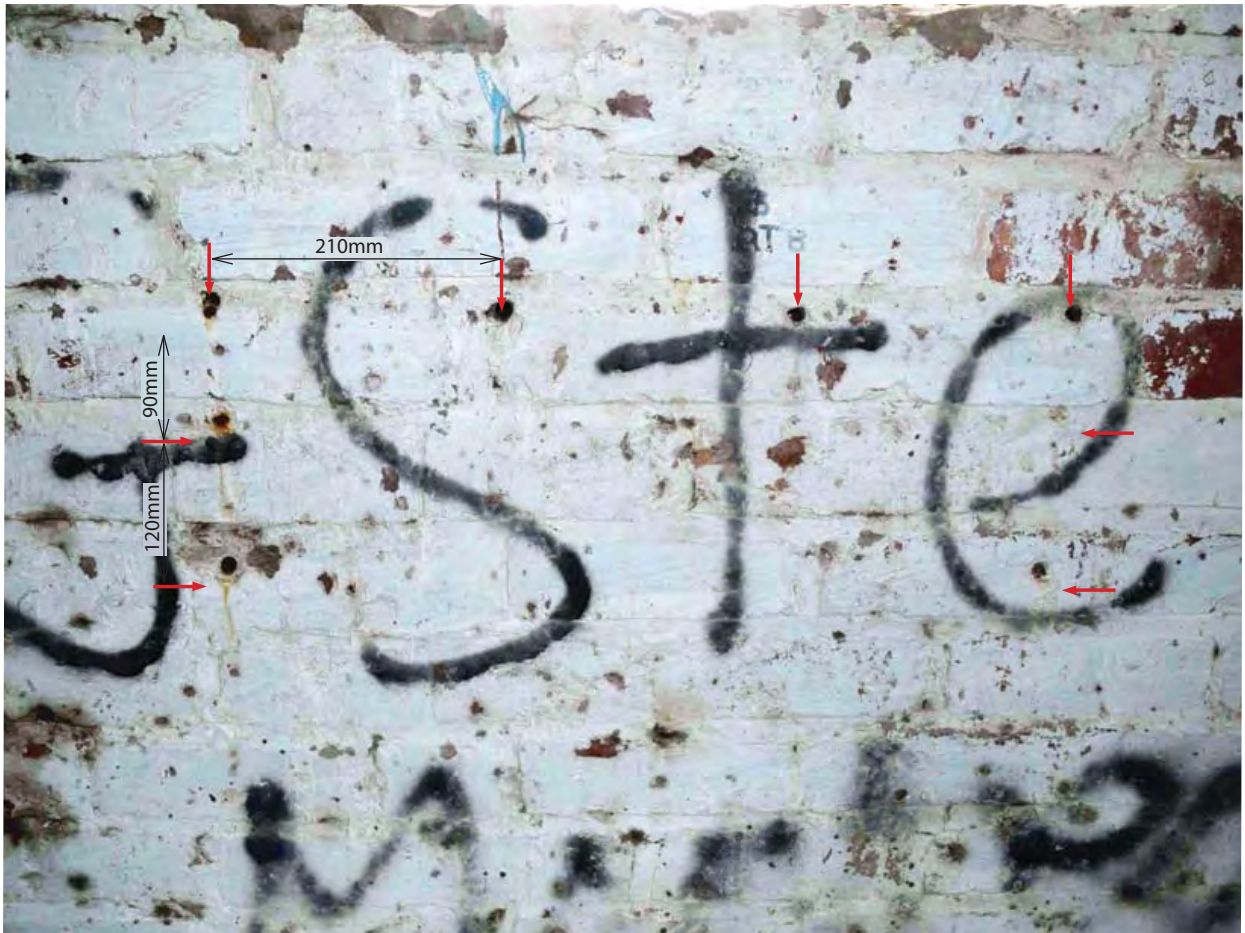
Drill holes under embrasure in south-west wall for fixing a shelf (red arrows point to holes) (27/10/2015)
